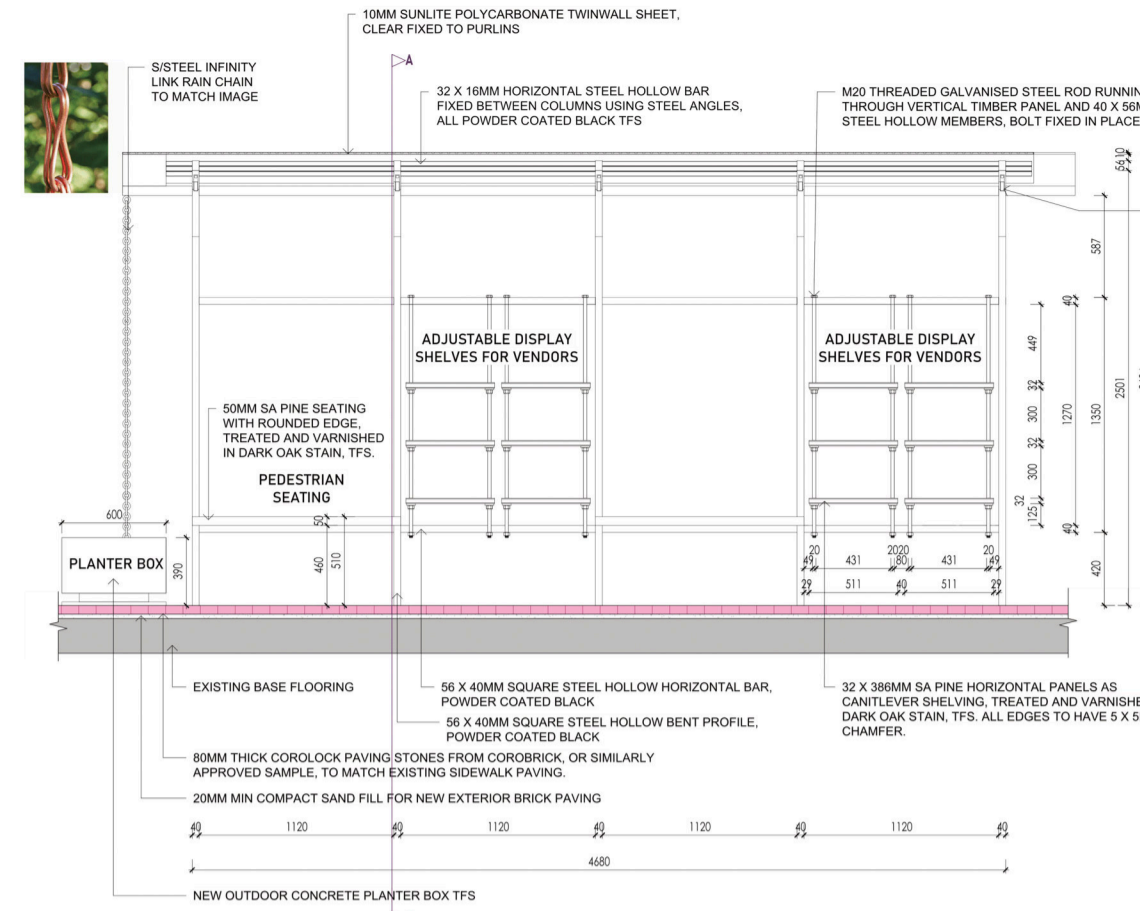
| 1:20 SECTION A-A THROUGH PEDESTRIAN STAND
